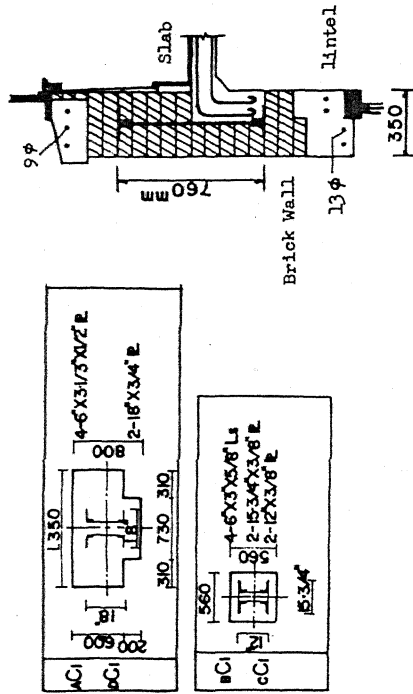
Section of Framing Members (First Floor) and Exterior Wall
